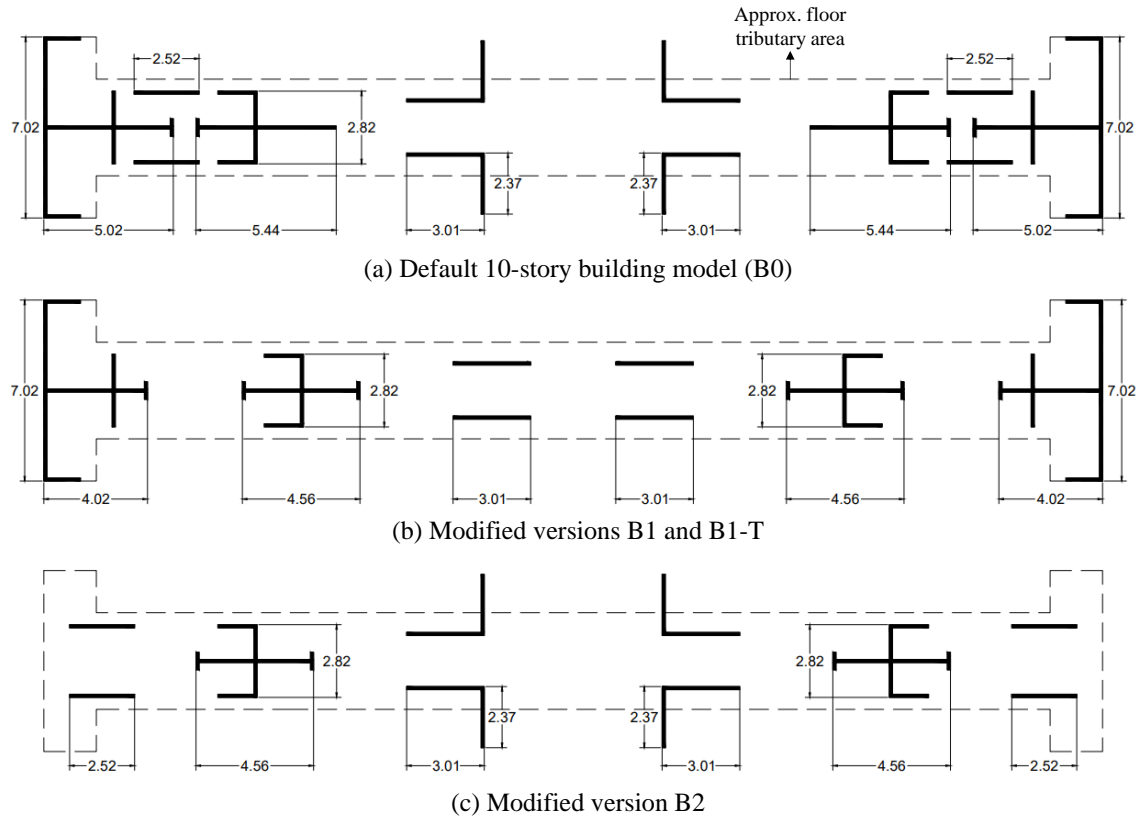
Structural layout of the modified 10-story building archetypes.
